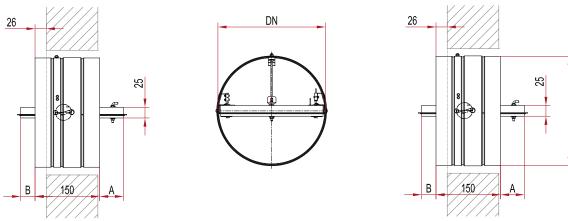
KTM-O-S-...-M damper (with a spring mechanism, sleeve connections)
